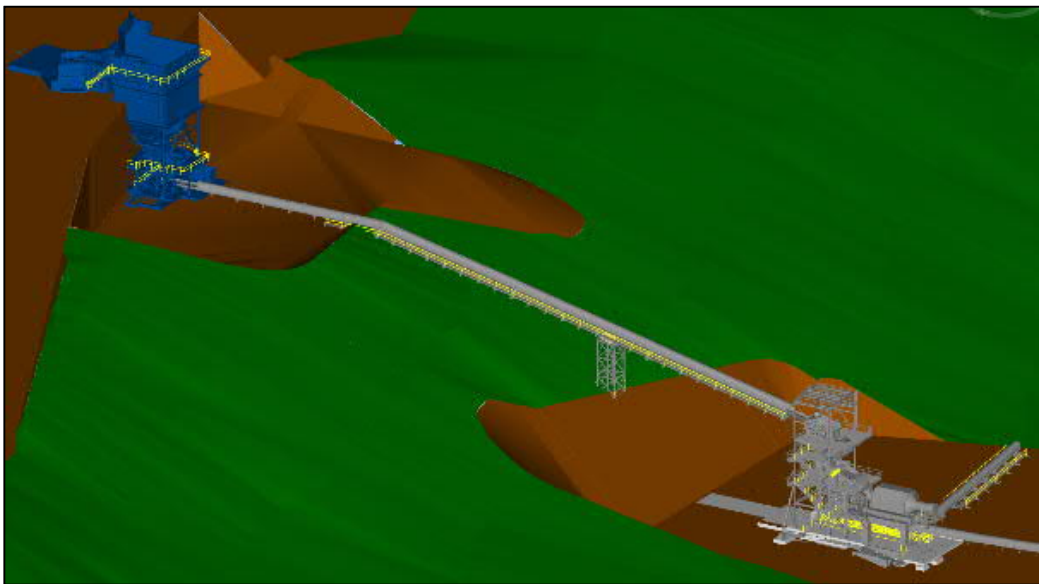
ROM Coal Handling Area View (Sedgman)
